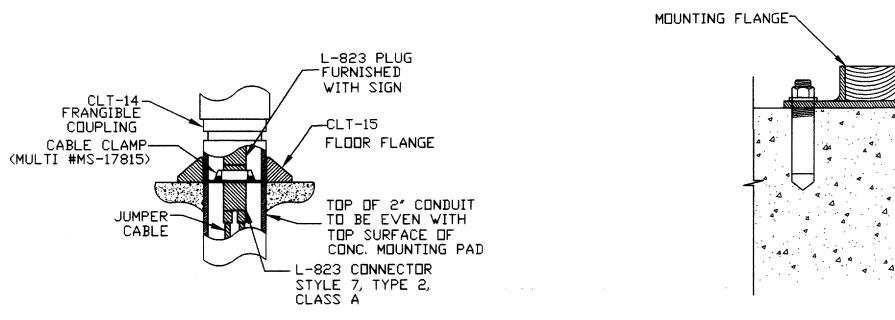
ELECTRICAL CONNECTION DETAIL
